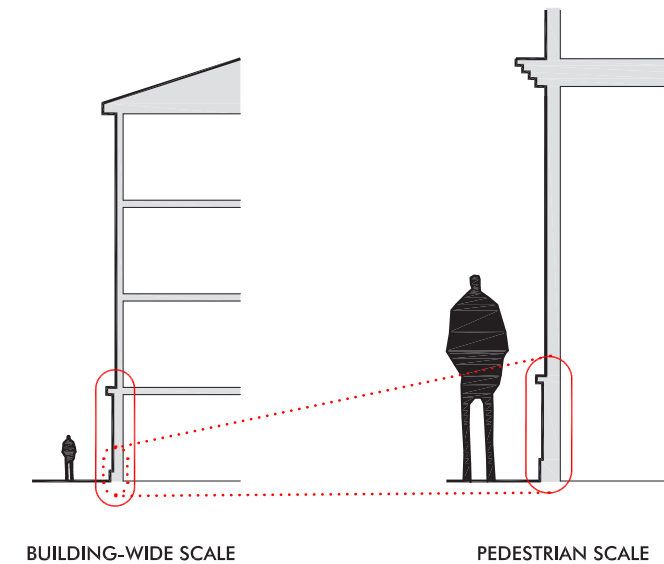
A.2.B. EXAMPLES OF EXTERIOR WAINSCOT FACADE BASE TREATMENT AT PEDESTRIAN SCALE AND BUILDING-WIDE SCALE
